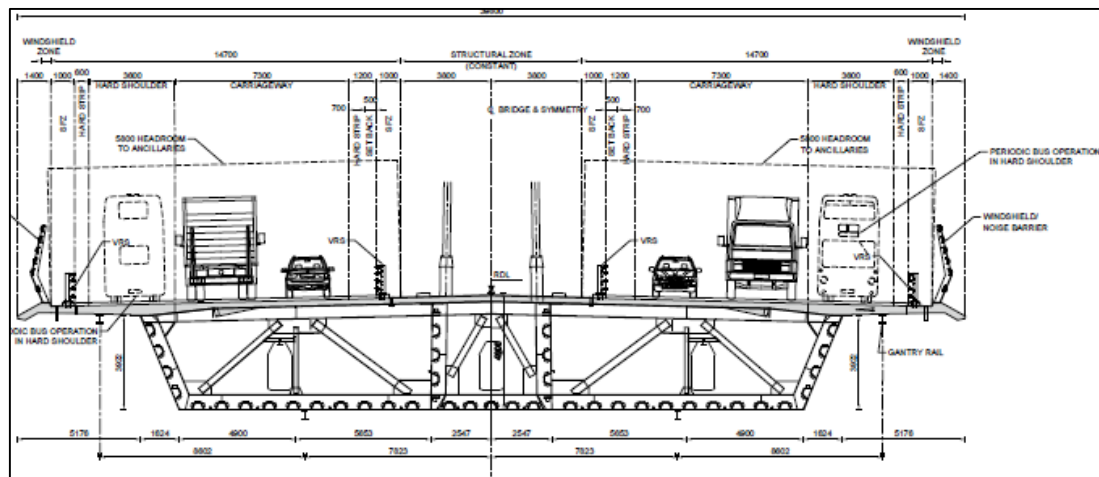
Single box deck section (cable-stayed bridge) (Transport Scotland, 2015)
